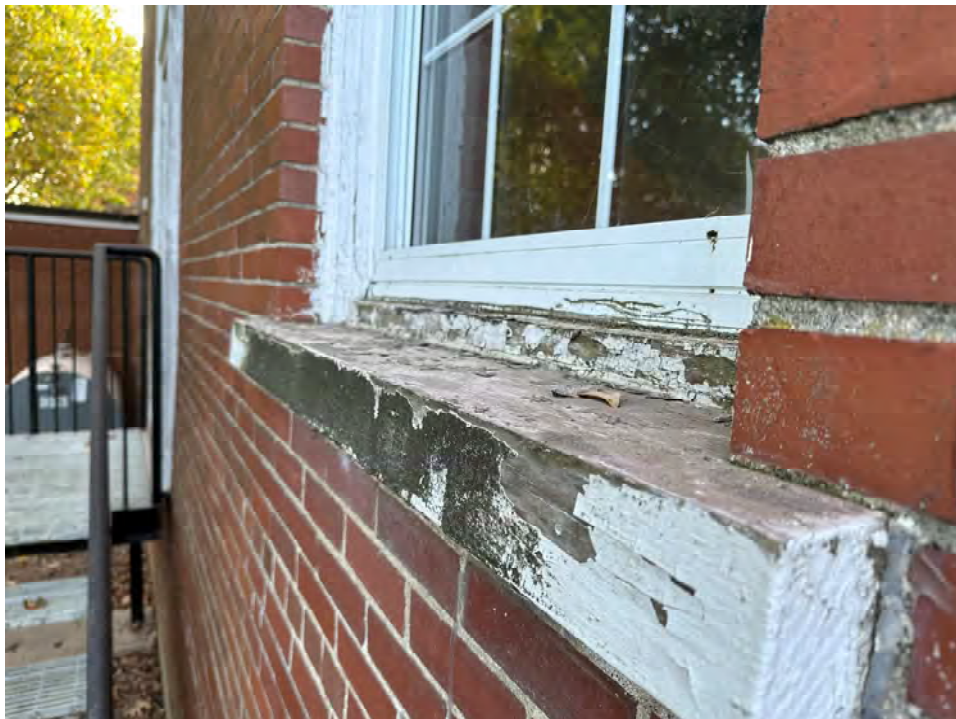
Failing paint finish on exterior window sill (typ. condition at others)
